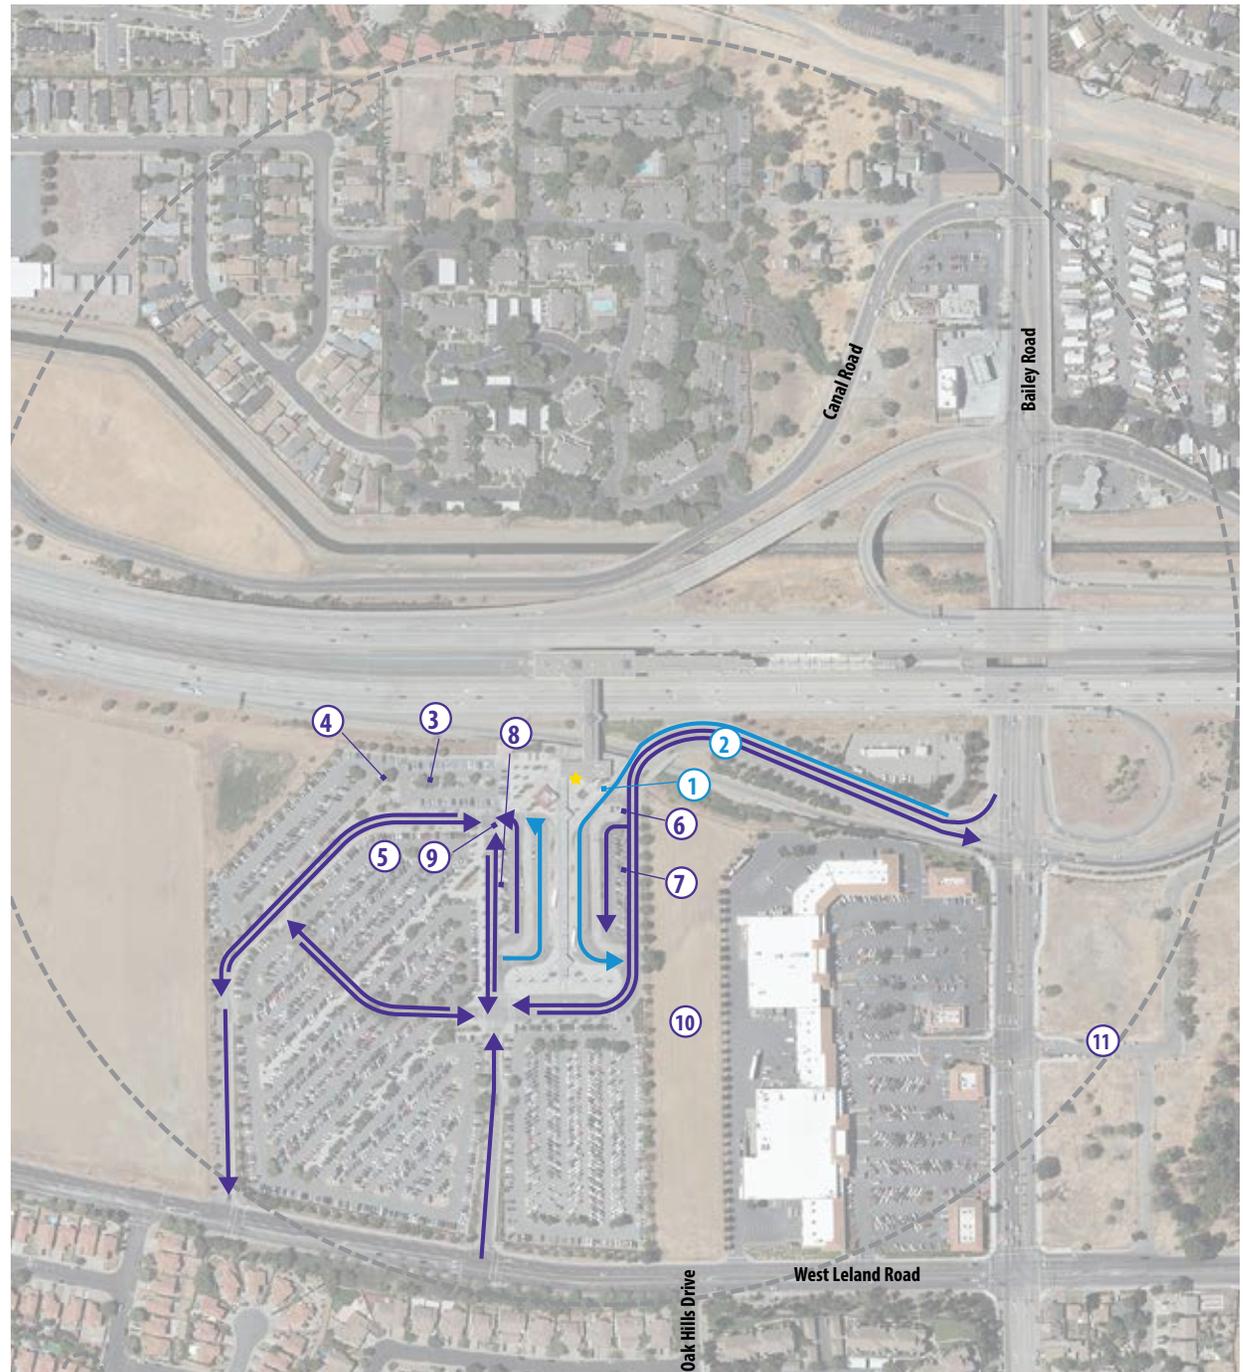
Pittsburg/Bay Point Station Existing Conditions - Transit Connections; Parking, Traffic and Passenger Loading
